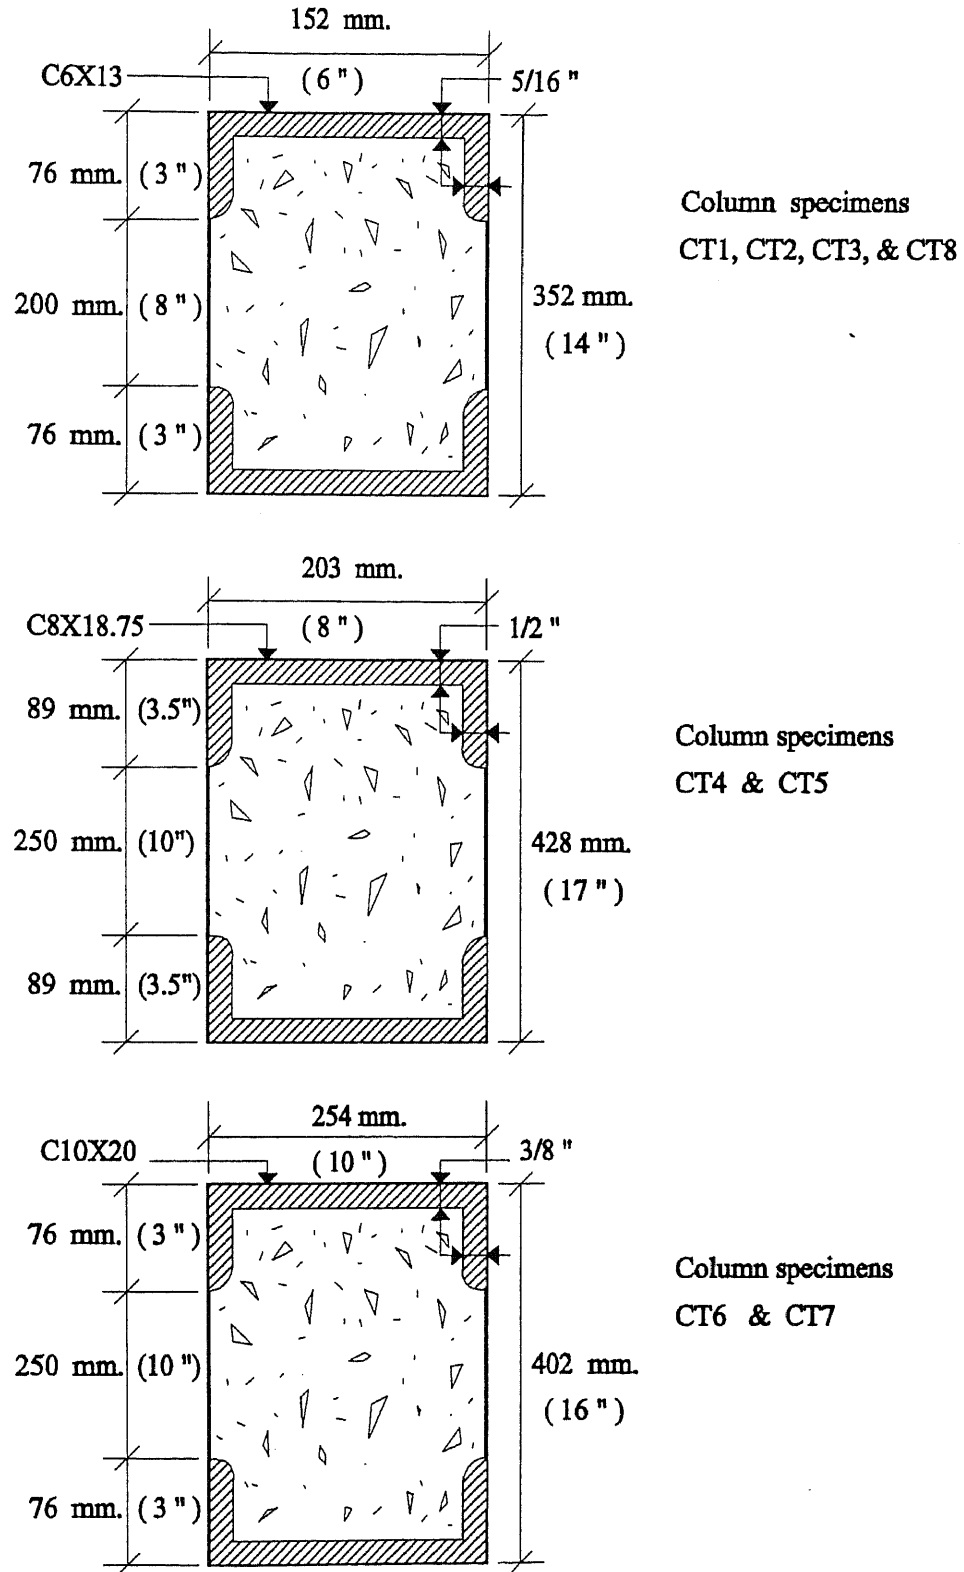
Composite column section for specimens tested by Taylor et al.
